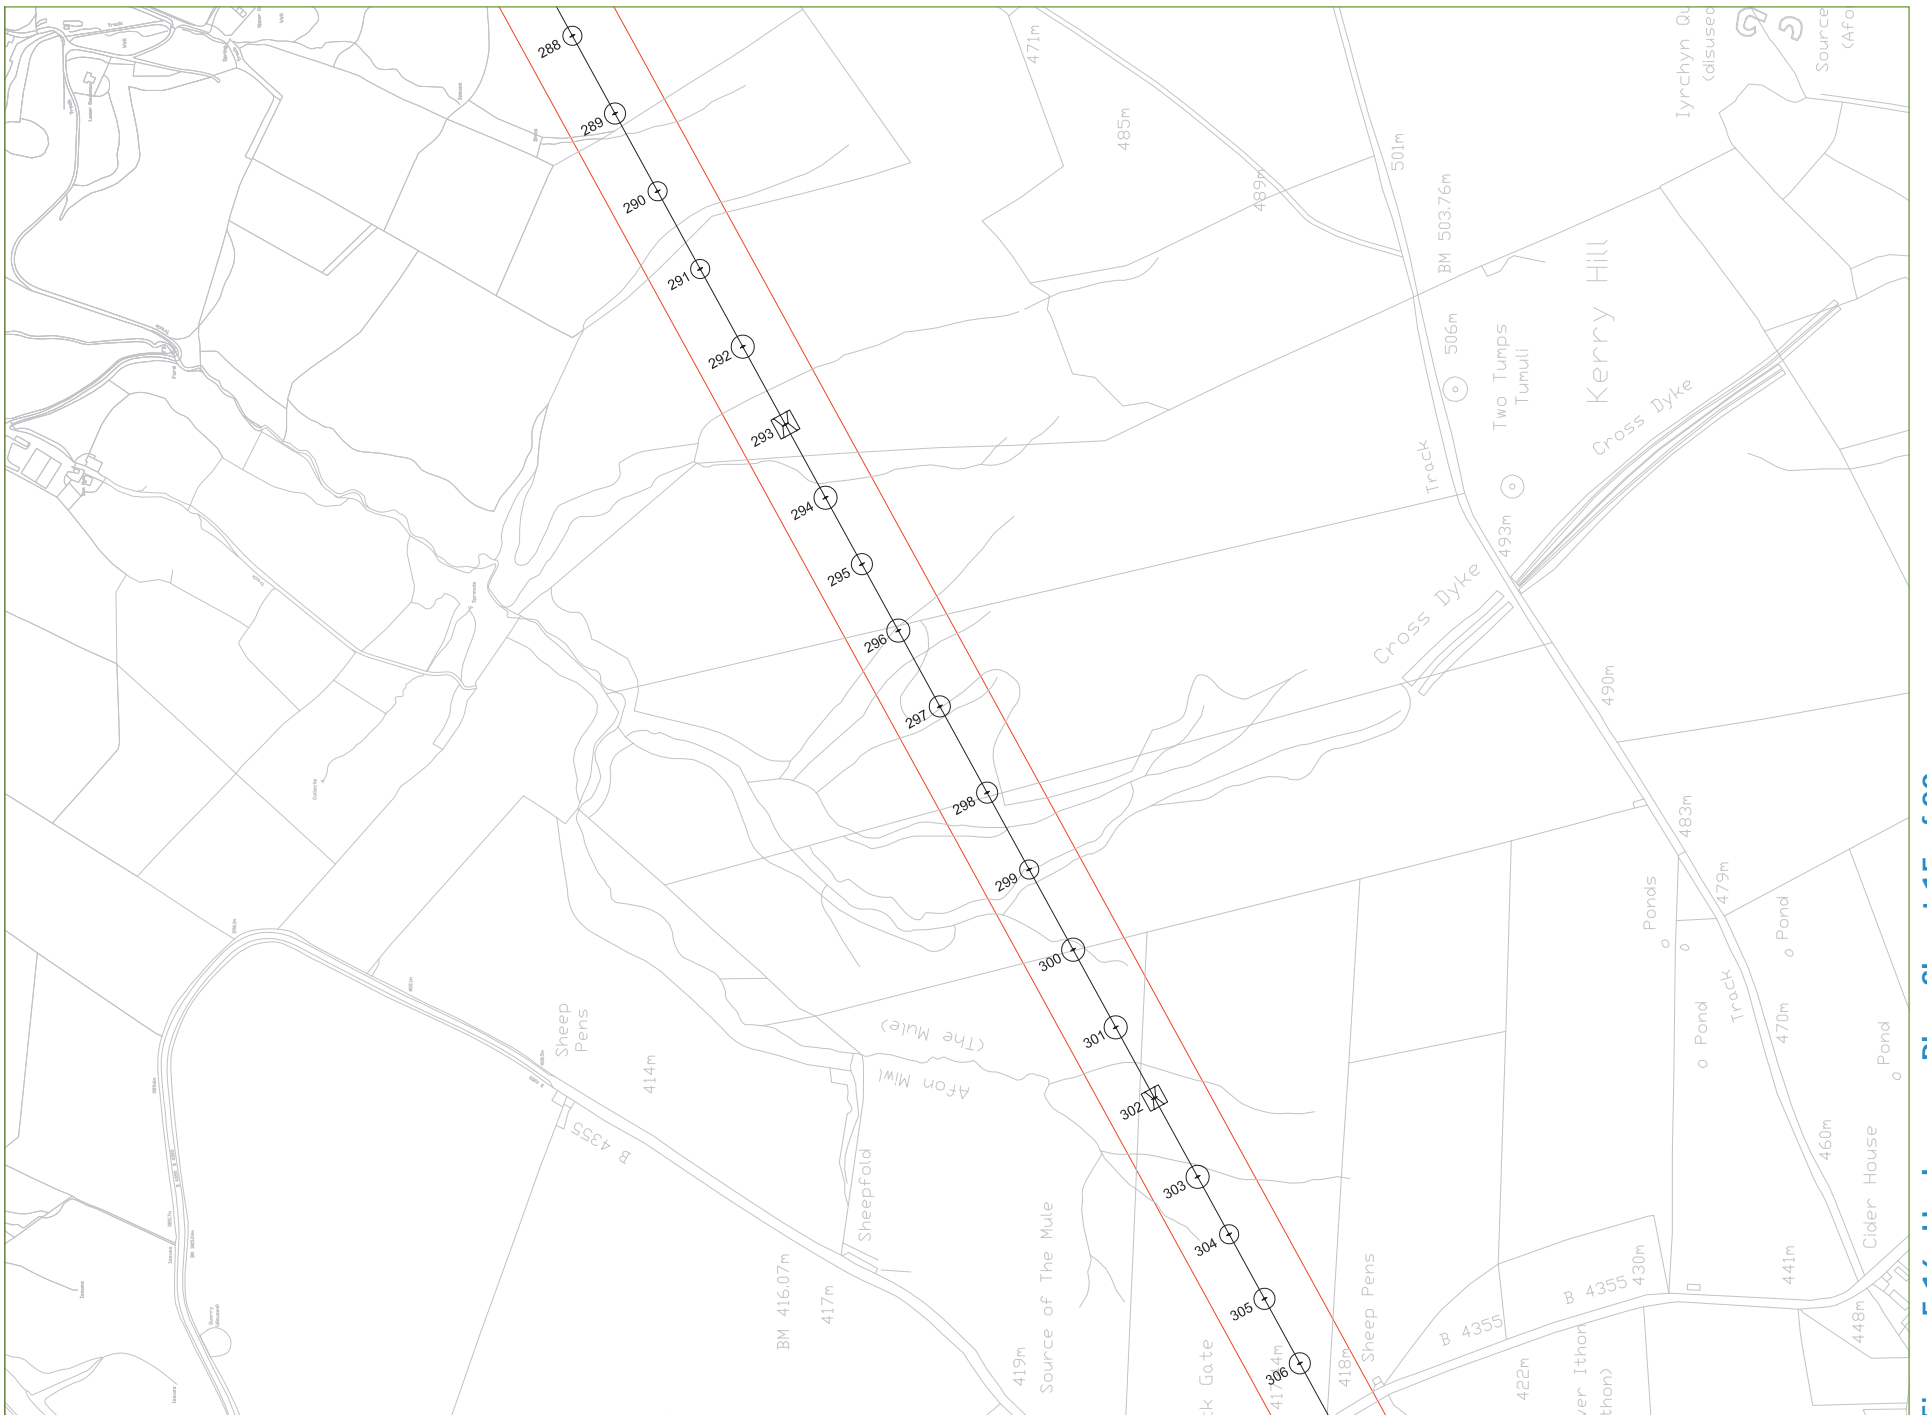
Hedgerow Plan Sheet 15 of 20
